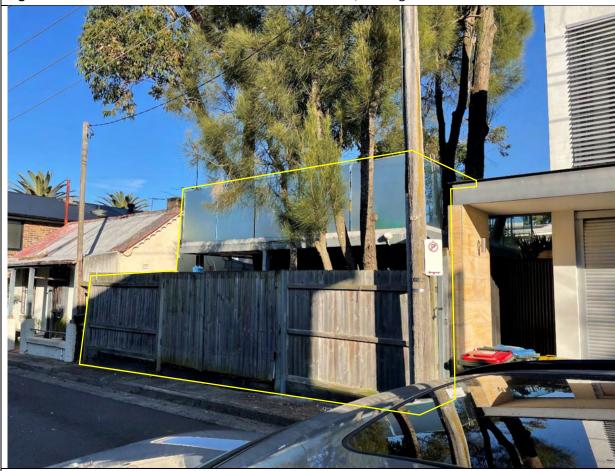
Rear of the child care centre from Isabella Street, looking east at the elevated play area.
